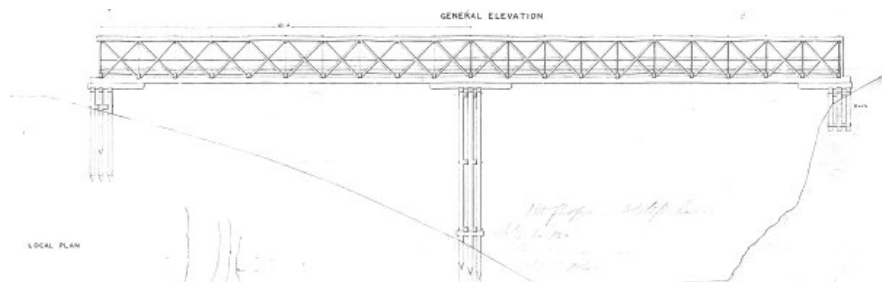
Plan of Vacy Bridge over Paterson River, Vacy built 1858 replaced 1898 (RTA Plans Archive).
